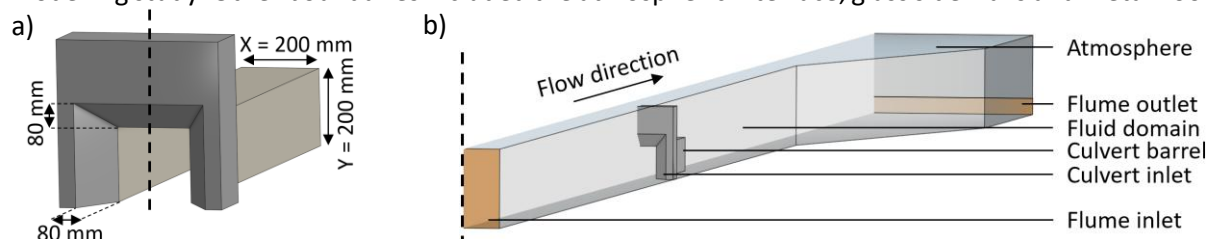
a) 30° wingwall and 30° headwall box culvert model and b) the half-flume and culvert simulation setup.
